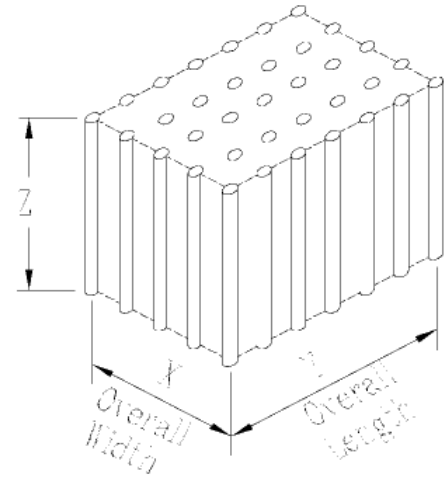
Pile Group Acting as a Block Foundation
